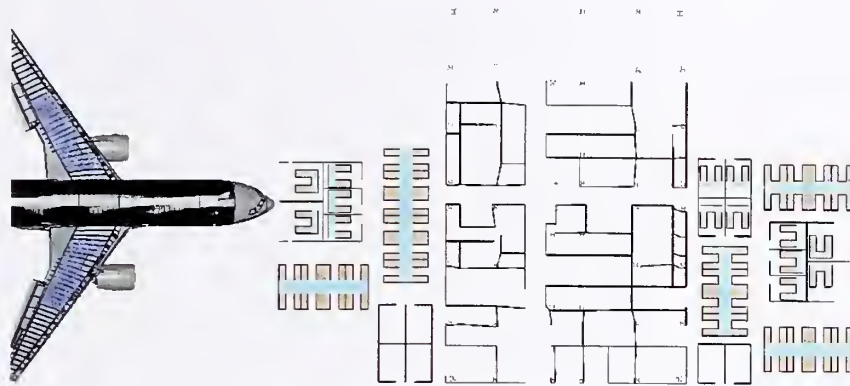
Case B damage to the slab of floor 96 of WTC 1.
